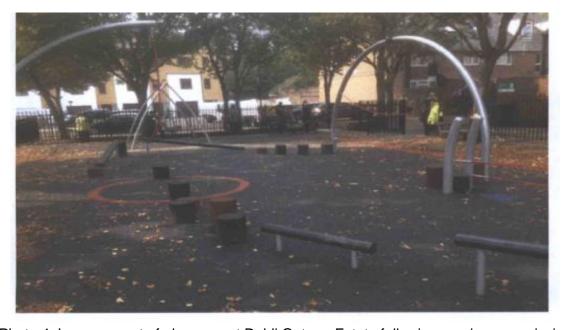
Improvement of play area at Dehli Outram Estate following previous permission
